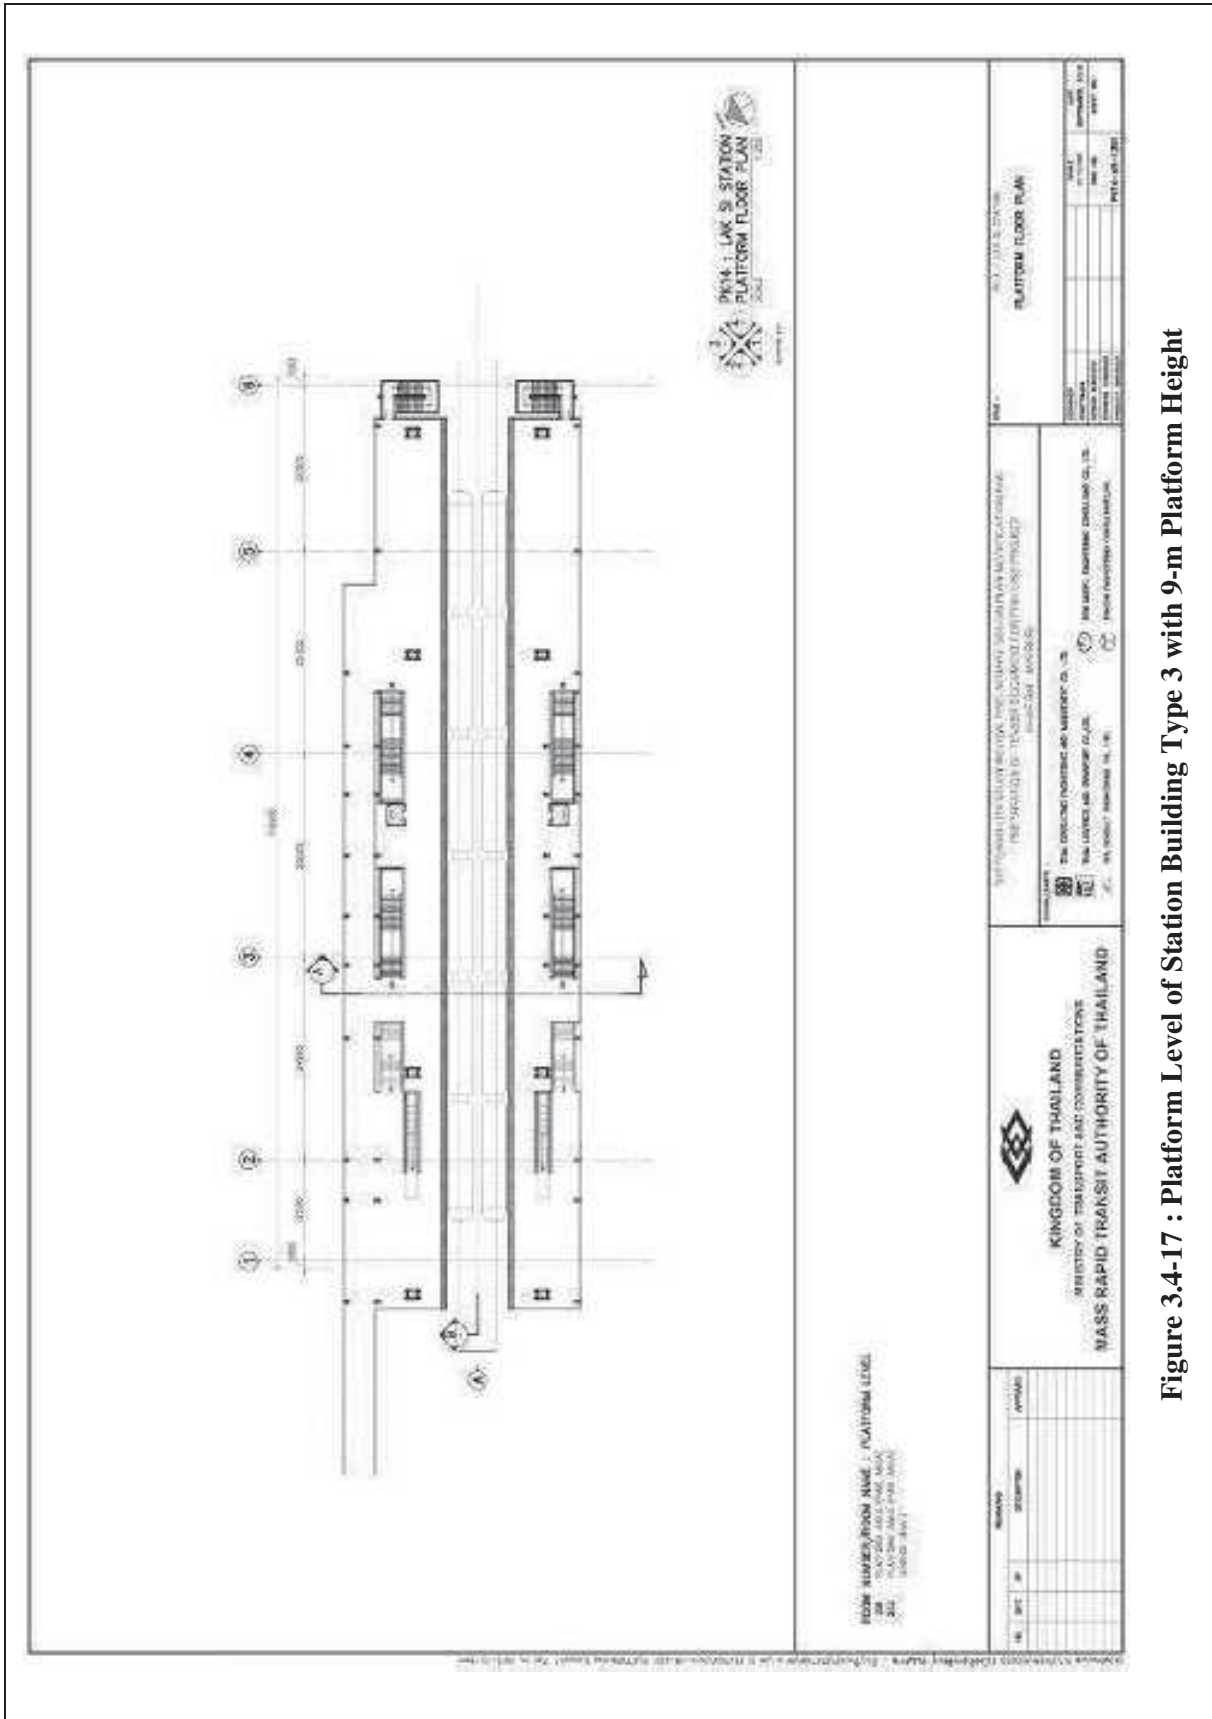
Platform Level of Station Building Type 3 with 9-m Platform Height
